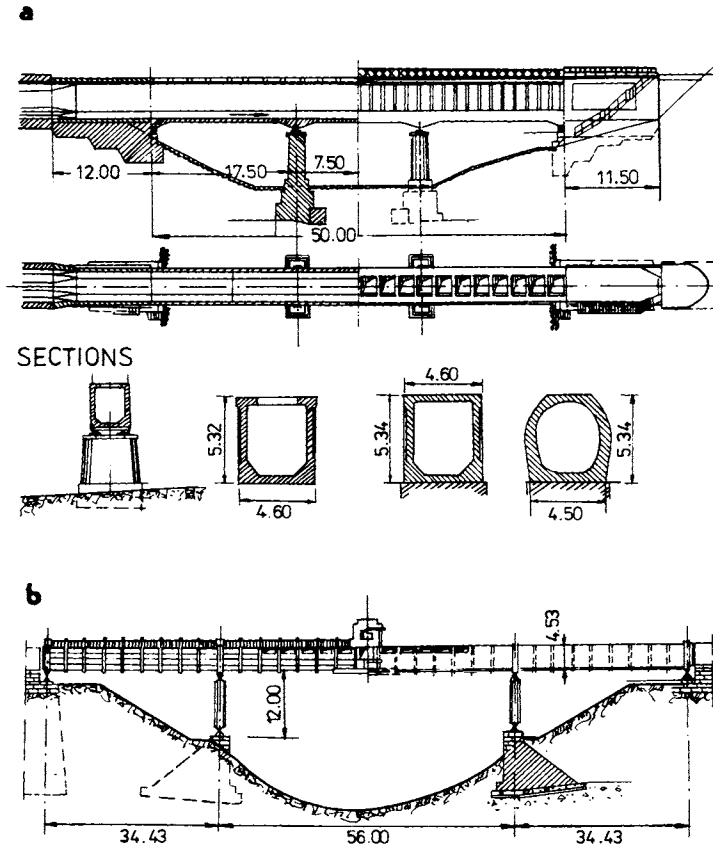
Aqueduct. a — reinforced concrete, b — steel.
